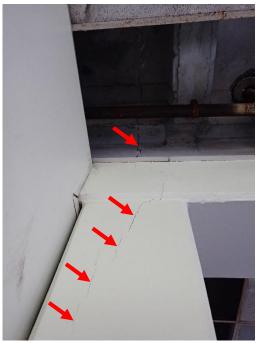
View of vertical cracks in north face of western column at interface with girder.
